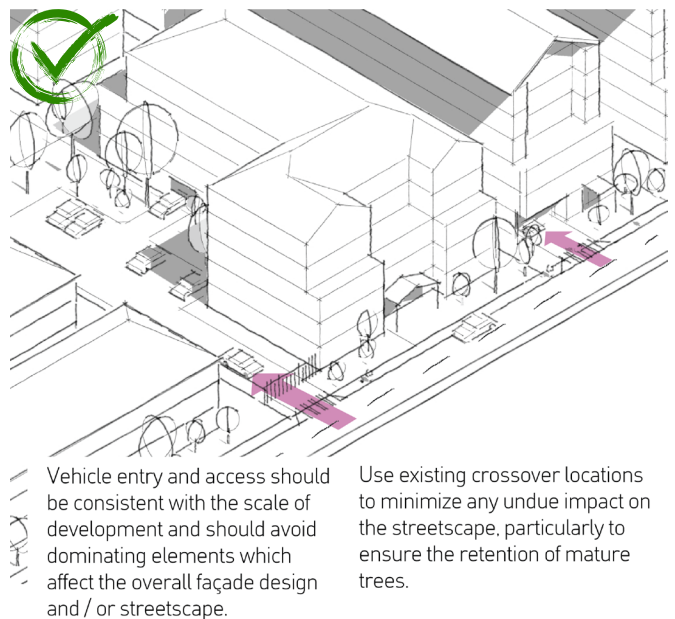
Multiple Dwellings - Vehicle Access Example Diagram
